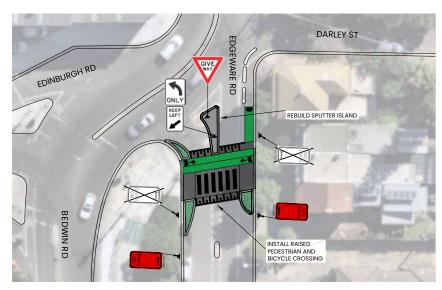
Edgeware Road between Darley Street and Lord Street
